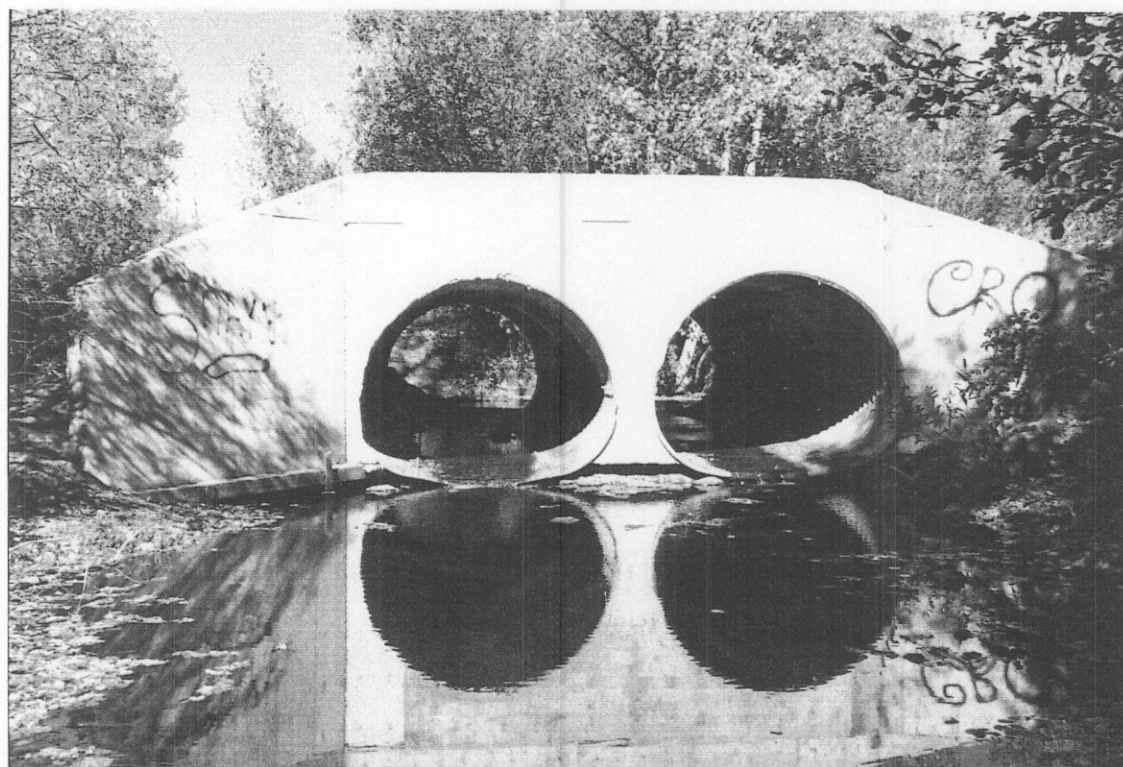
• NAHOUNLI CREEK LOOKING UPSTREAM AT ASH ROAD BRIDGE CULVERTS (SECTION 11)
